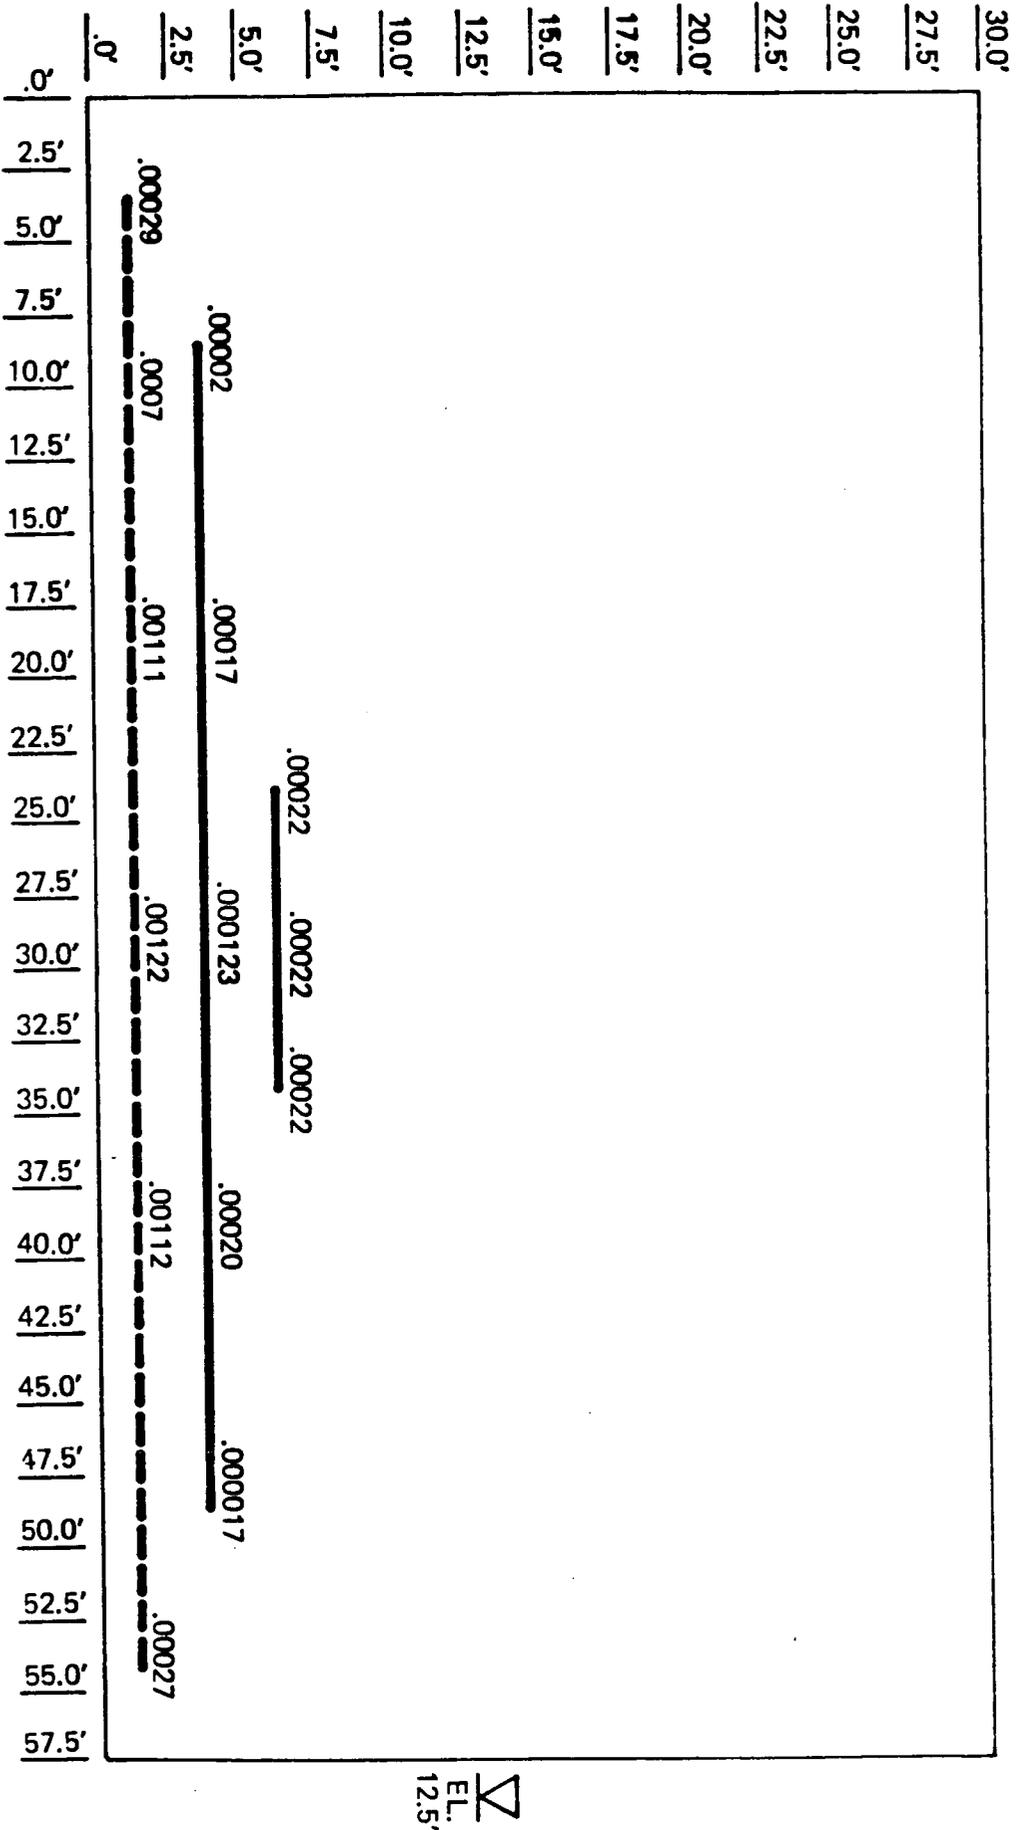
CONDENSATE STORAGE TANK AREA WALL (a)
